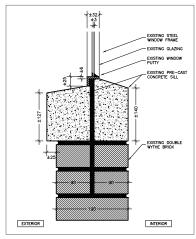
Detail of typical existing window section at sill (LGA, 2017).
